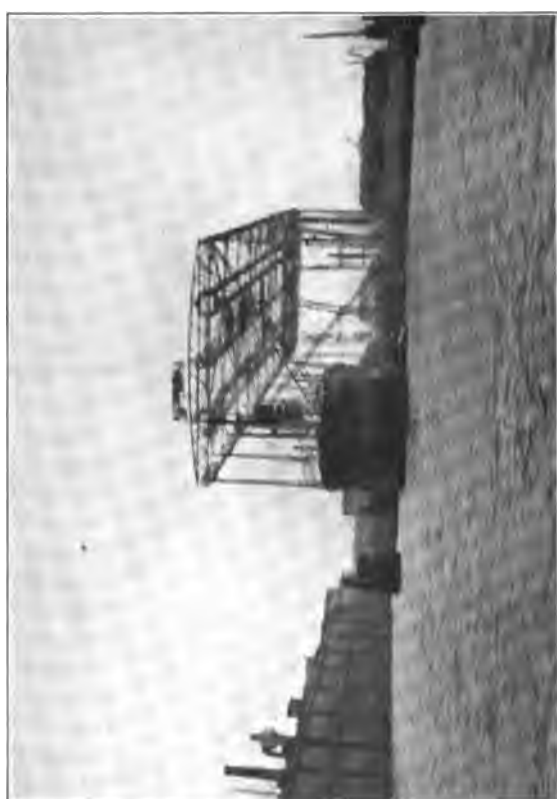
Hamburg. Ship-building Plant; Dry Dock; Great Crane.
